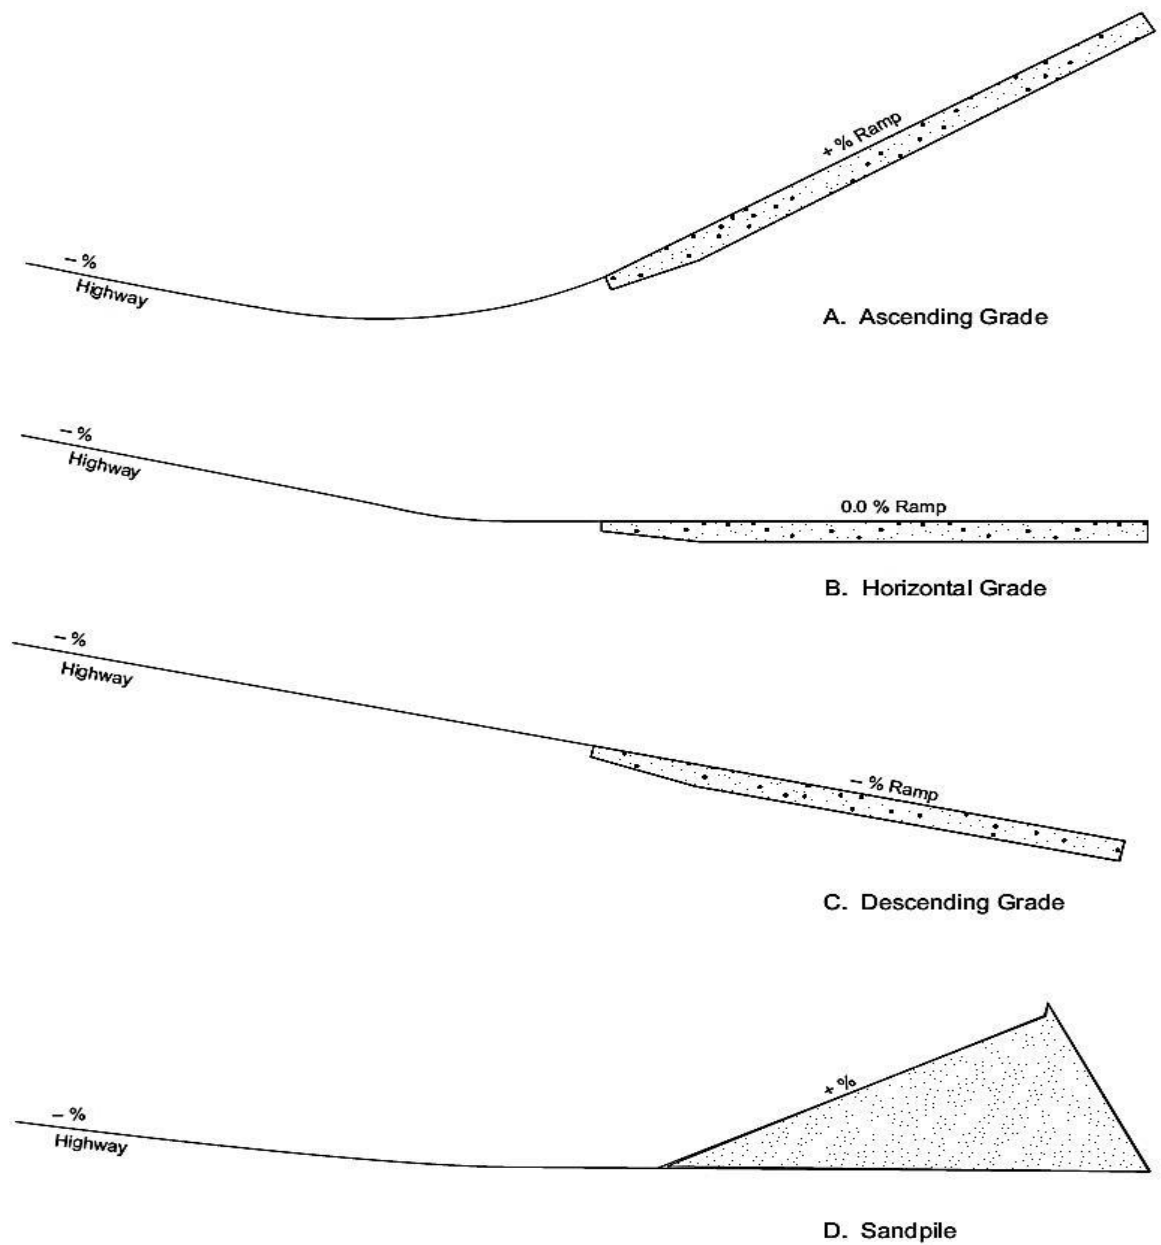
/1: Basic Types of Emergency Escape Ramps [1, p.3-144]
